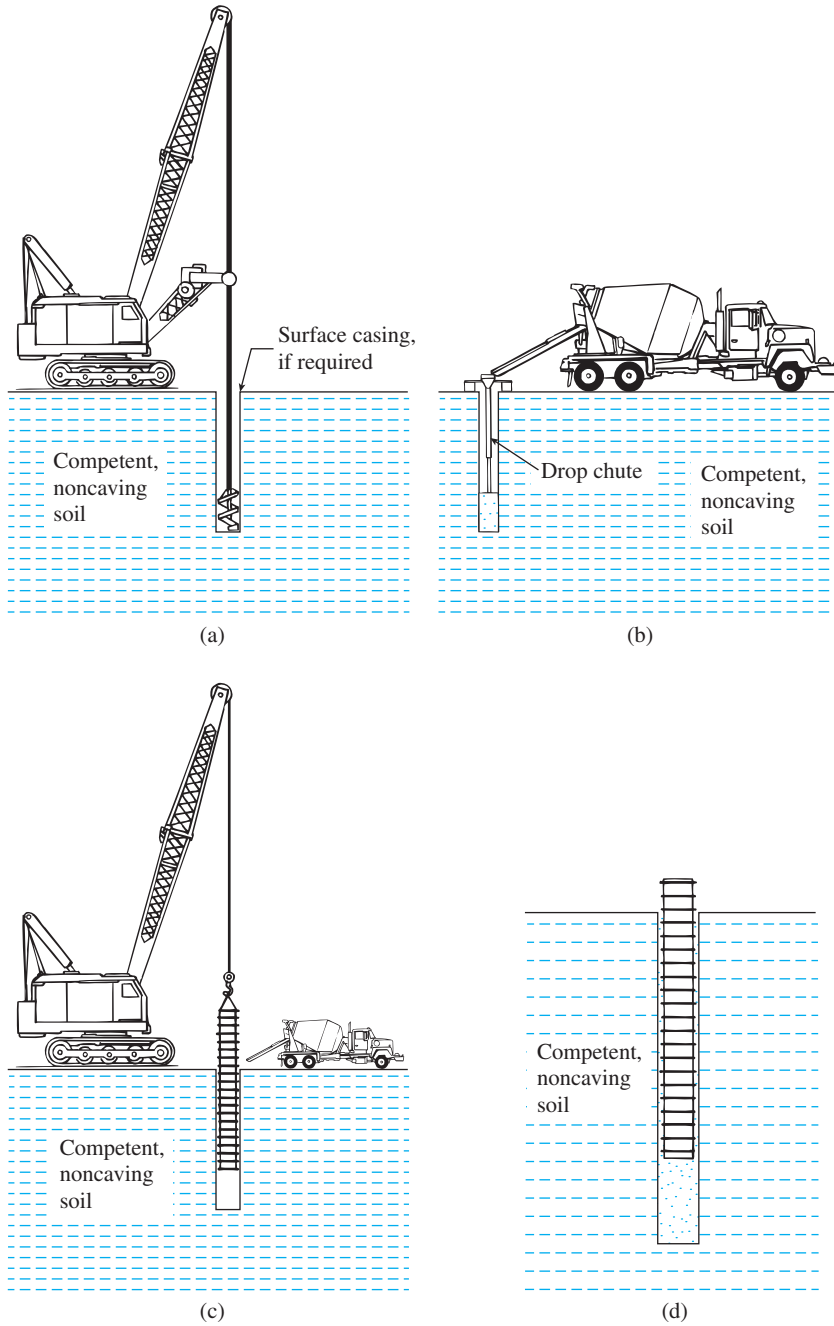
Dry method of construction: (a) initiating drilling; (b) starting concrete pour; (c) placing rebar cage; (d) completed shaft (After O'Neill and Reese, 1999)
